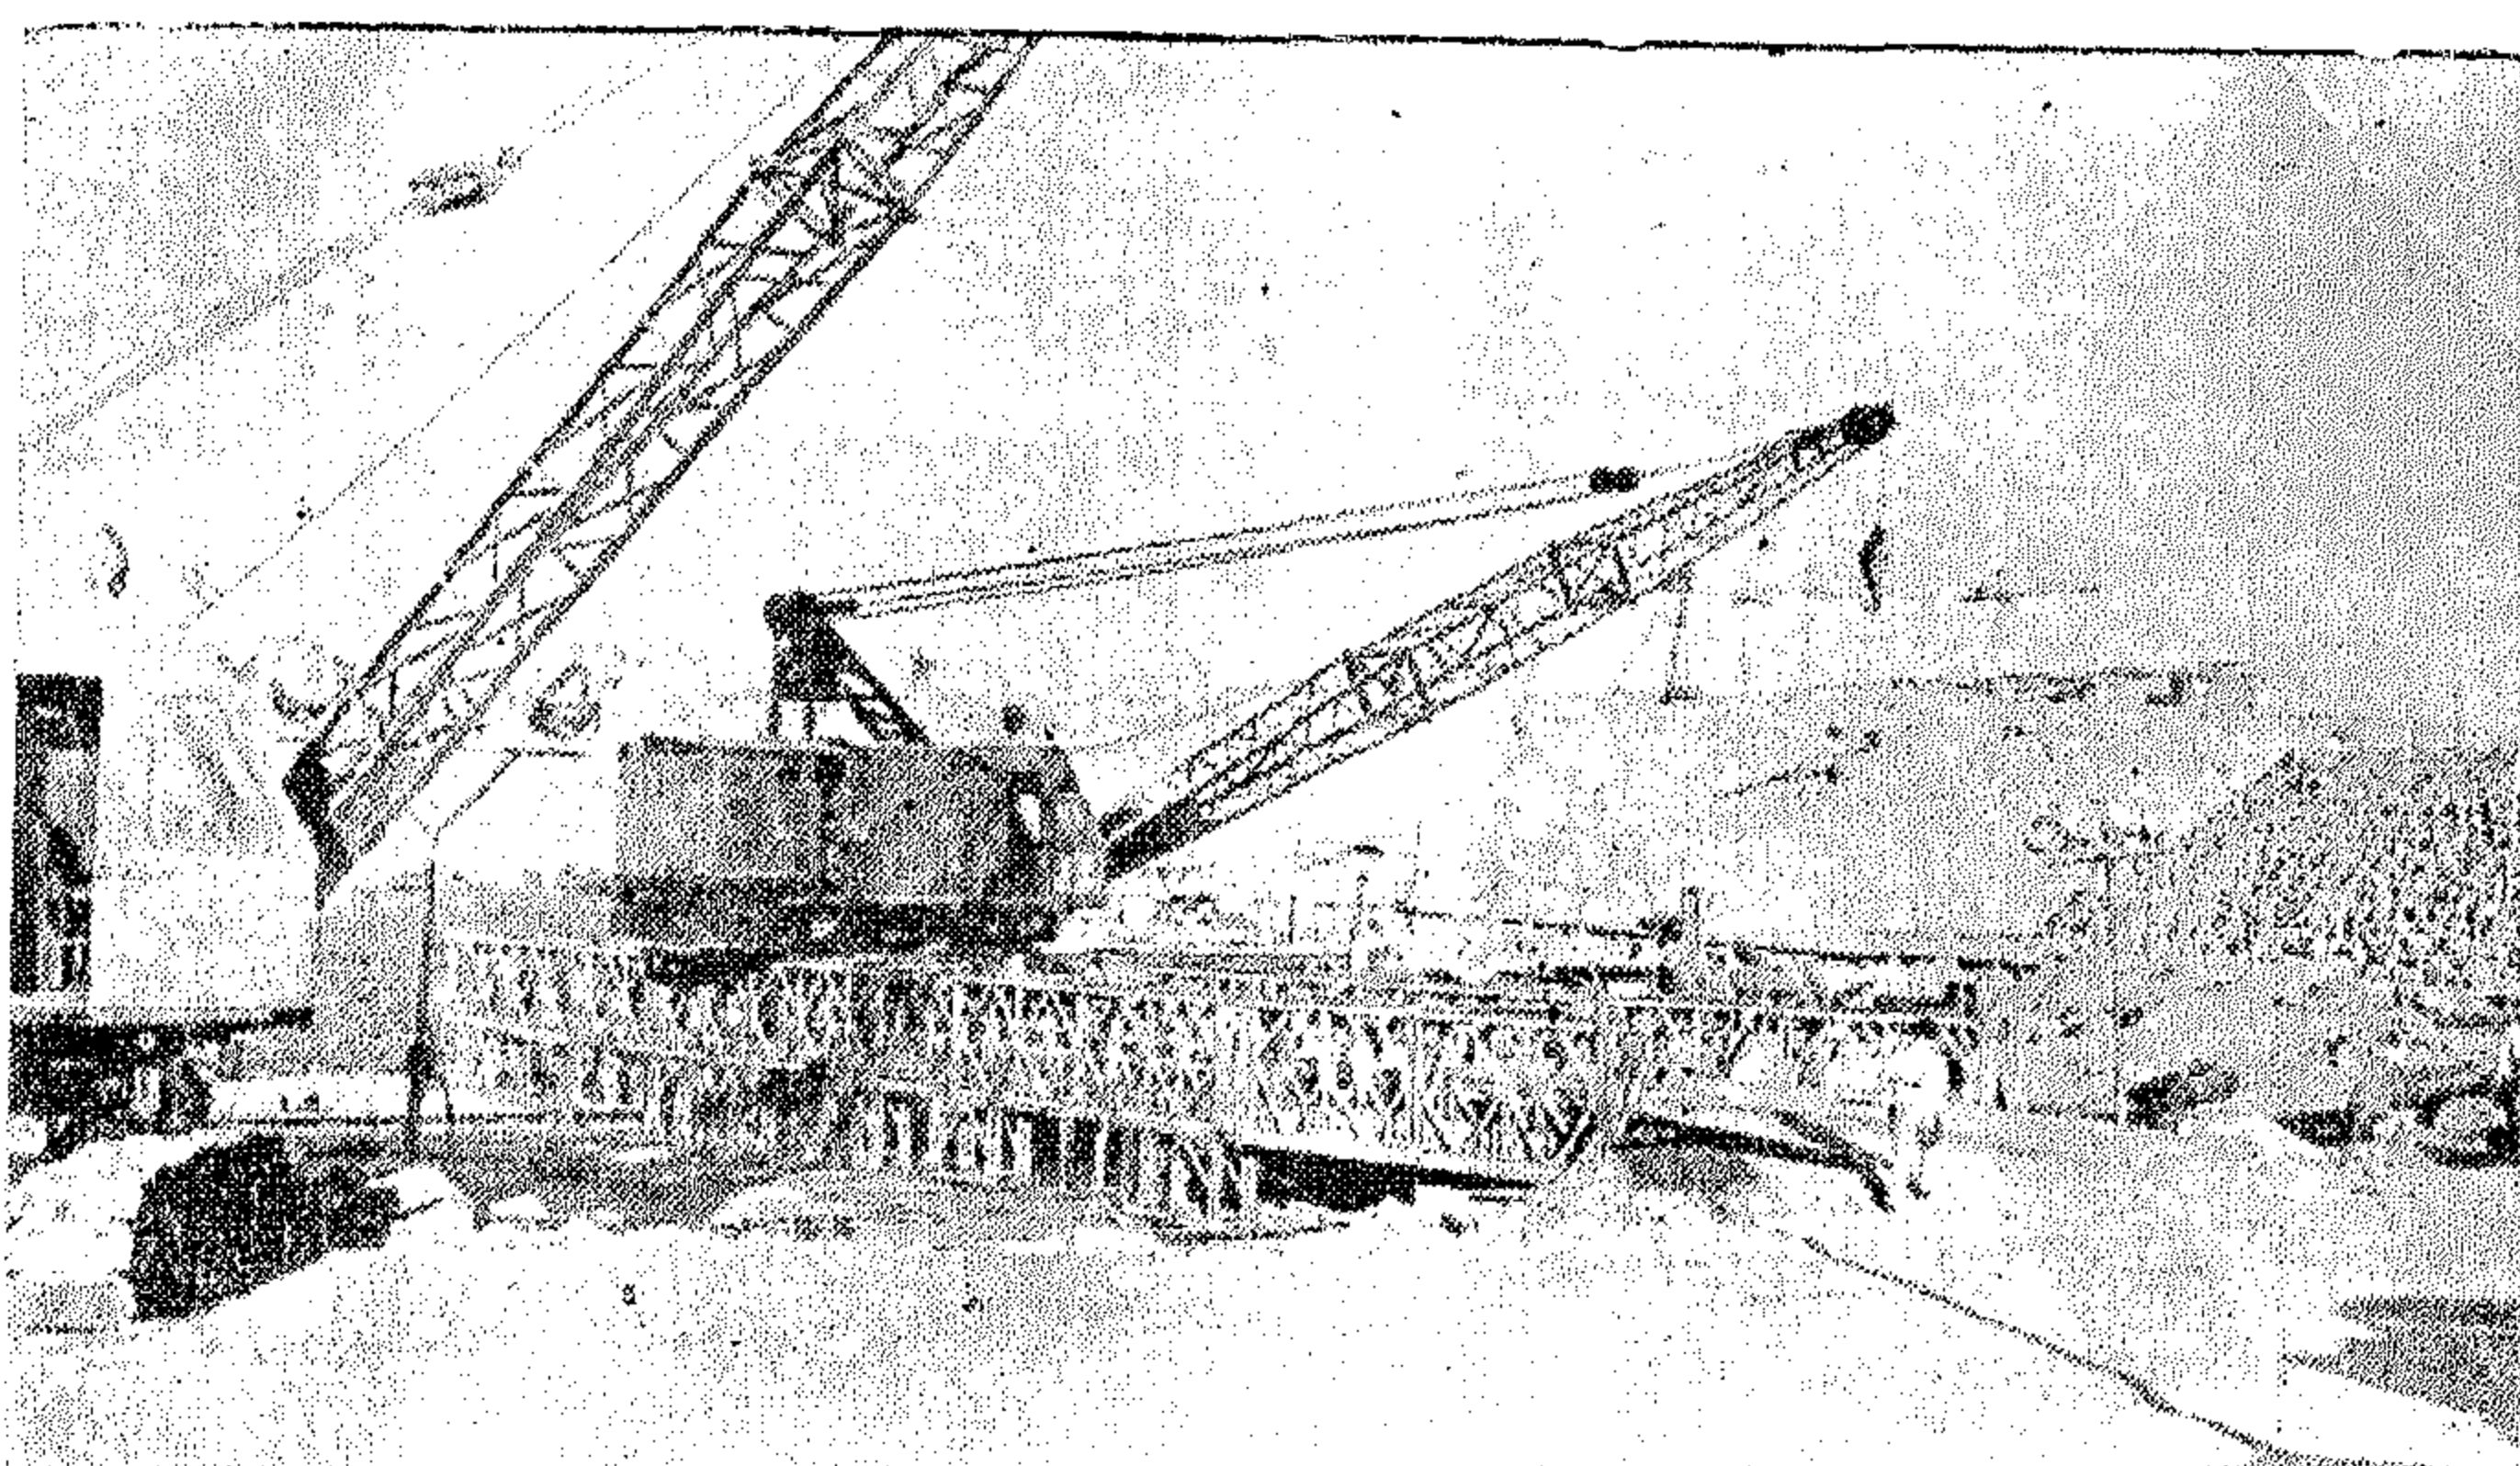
Constructing floating deck with ramp connected to bank after loading the crane E 2005 (90 tons weight).
